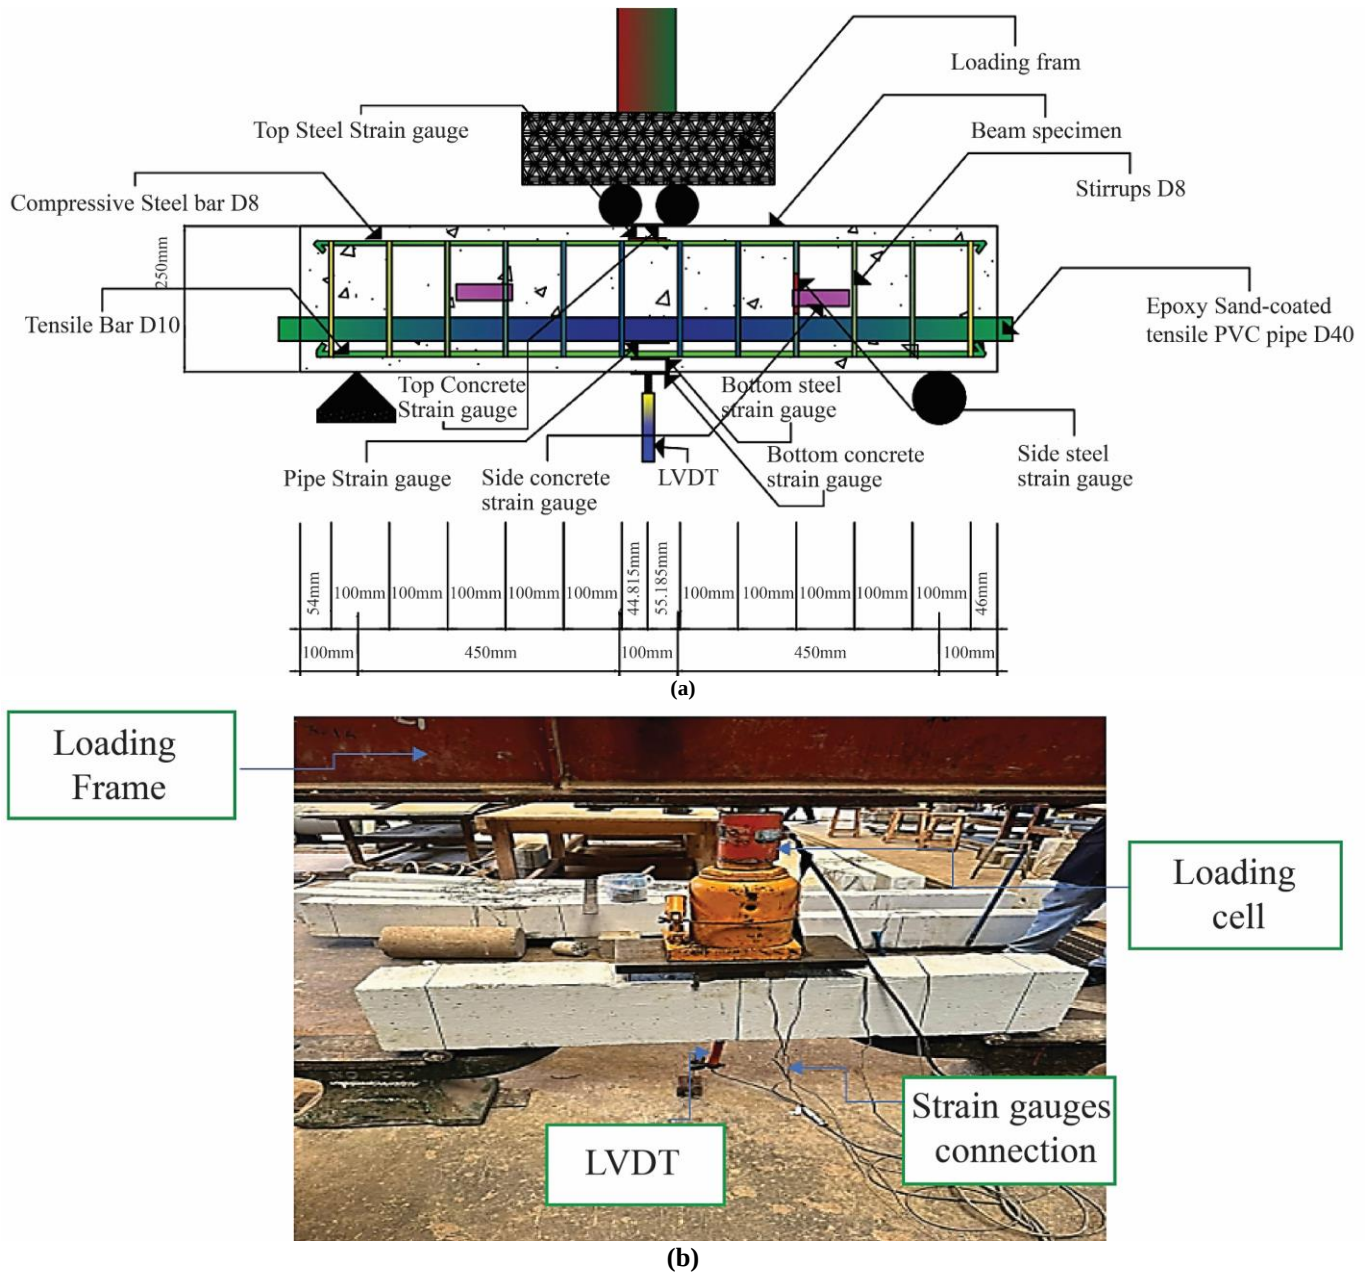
Four-point bending test set-up, (a) Schematic of the loading arrangement with dimensions, (b) photograph of a beam in position on the testing machine before loading.
